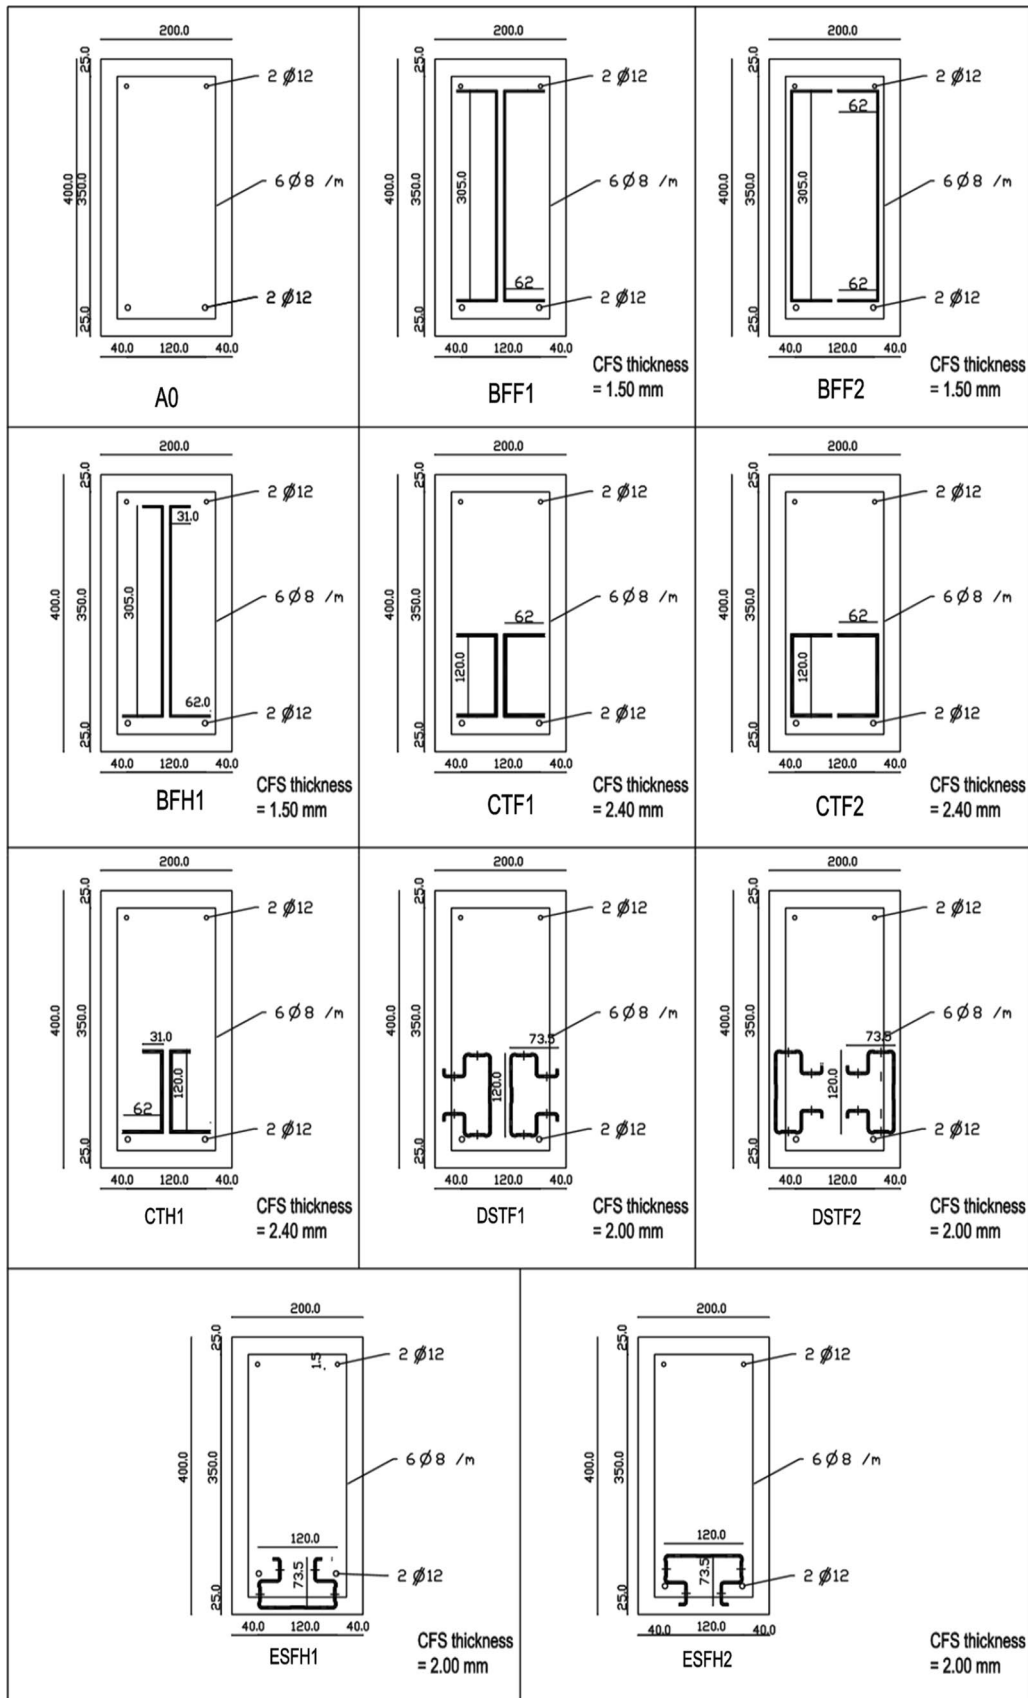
typical sections of the tested specimens (all dimensions in mm)
